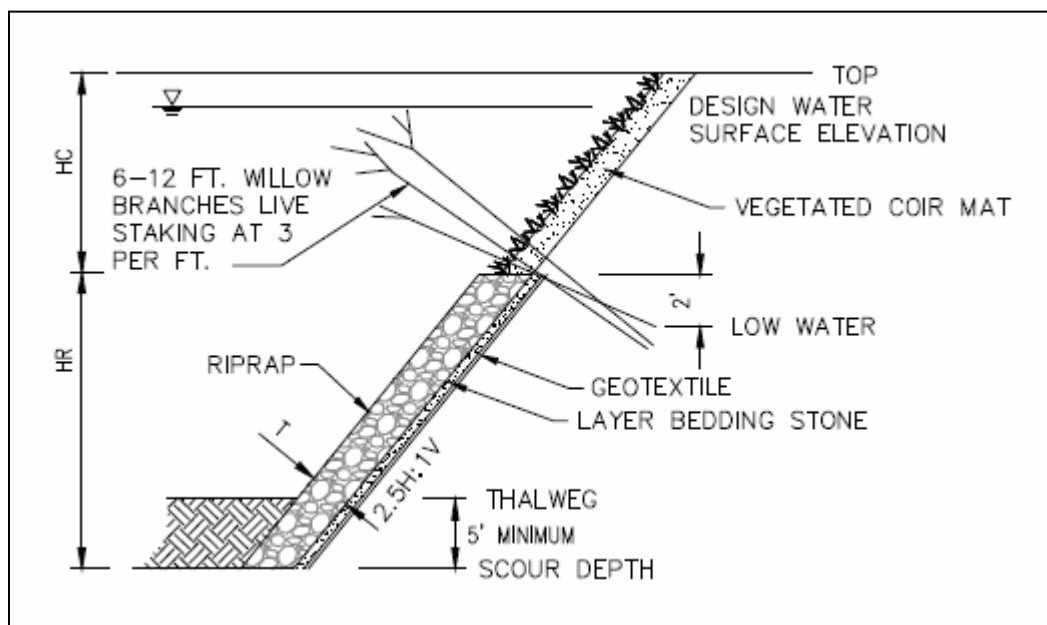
Typical Bioengineered Bank Scour Protection Measures.
